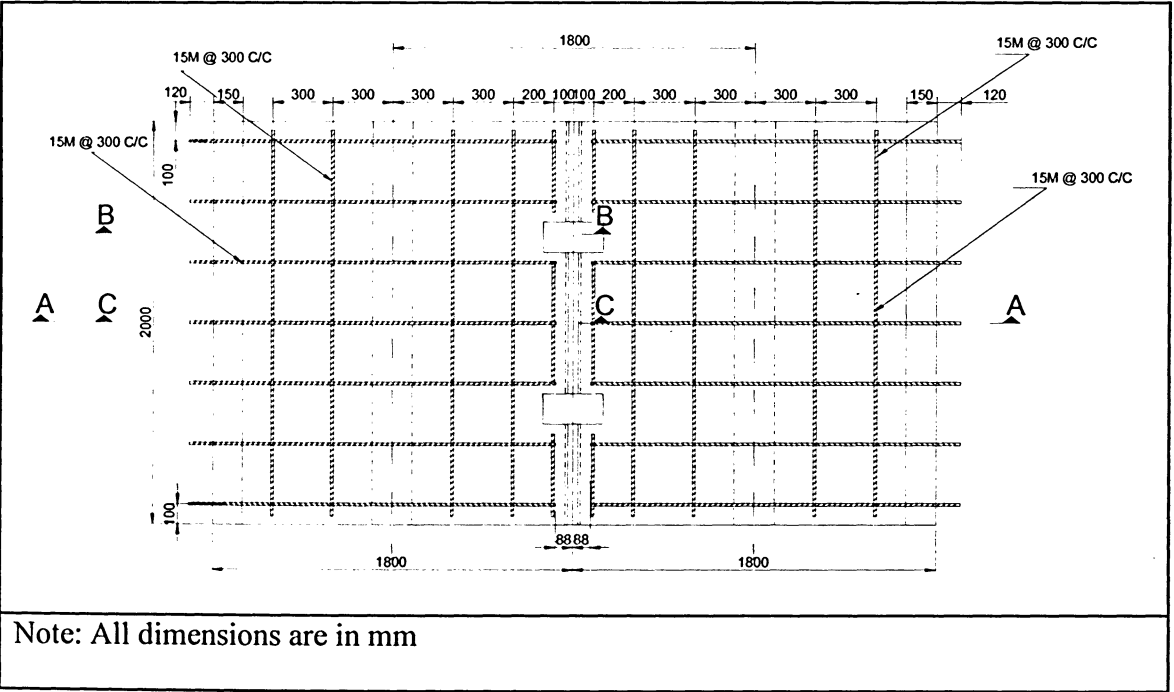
(b) Plan of Top Rebar Arrangement for Model M4
